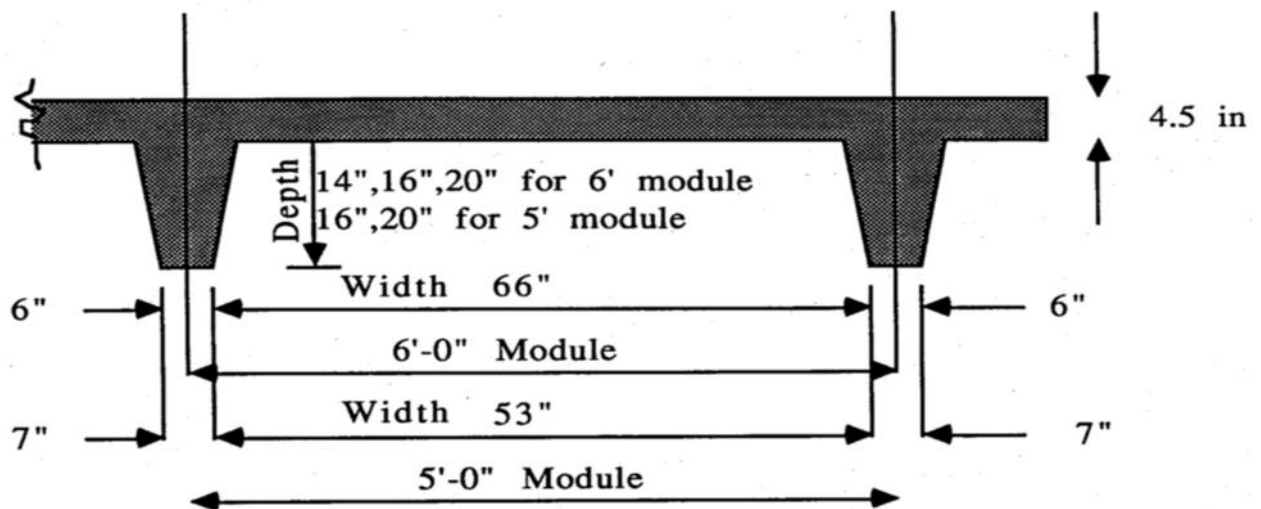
(a): Typical Wide-Module Joist Slab Systems (Hanna and Sanvido 1989)
